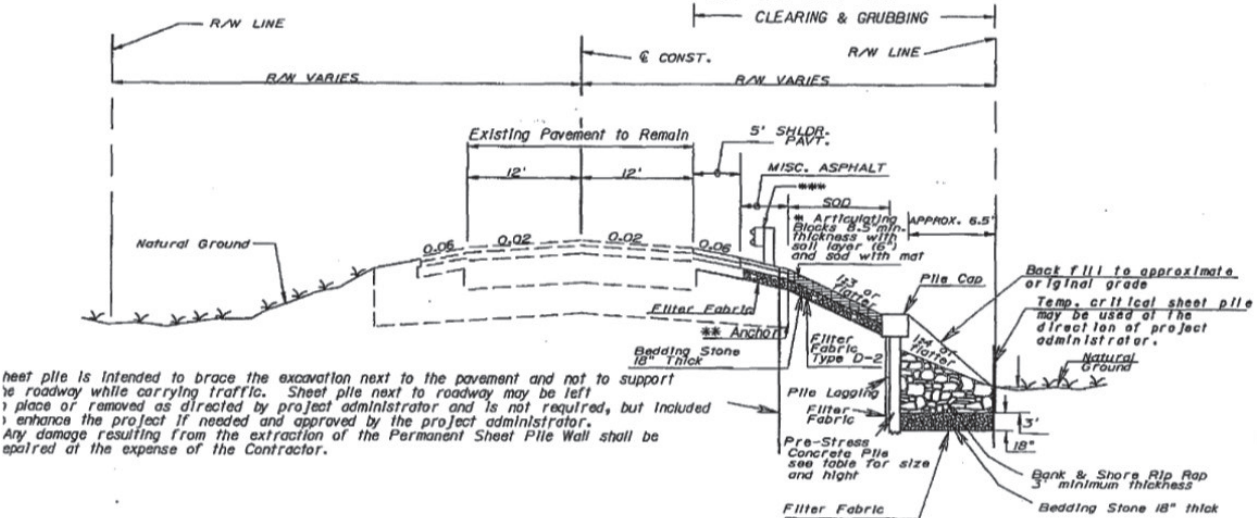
Typical armoring detail 1 for 1:3 slopes or flatter (Courtesy of Florida DOT).
